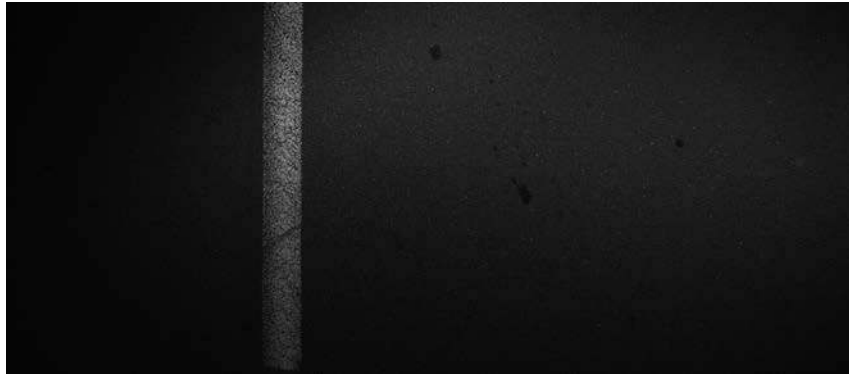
Image with low pavement texture, markings, and oil spots without cracks (LEHMANN+PARTNER 2014).
